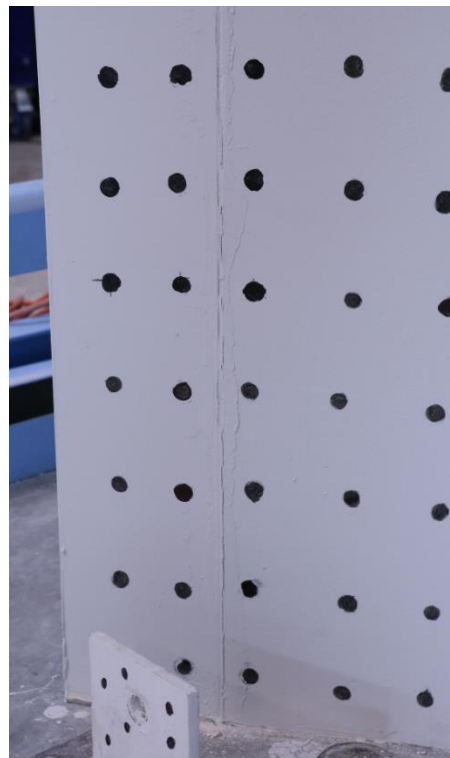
Specimen B1 – Step 8 – DS0: Hairline paint cracking at L-junction - location 6
